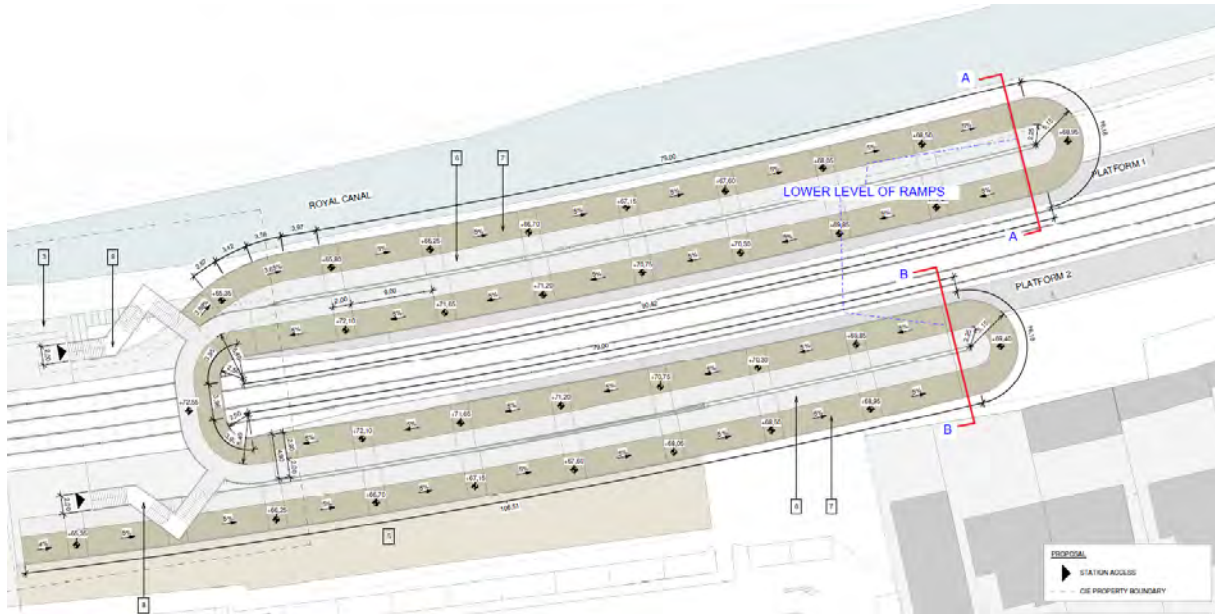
Plan of proposed Coolmine Station bridge with section marks
